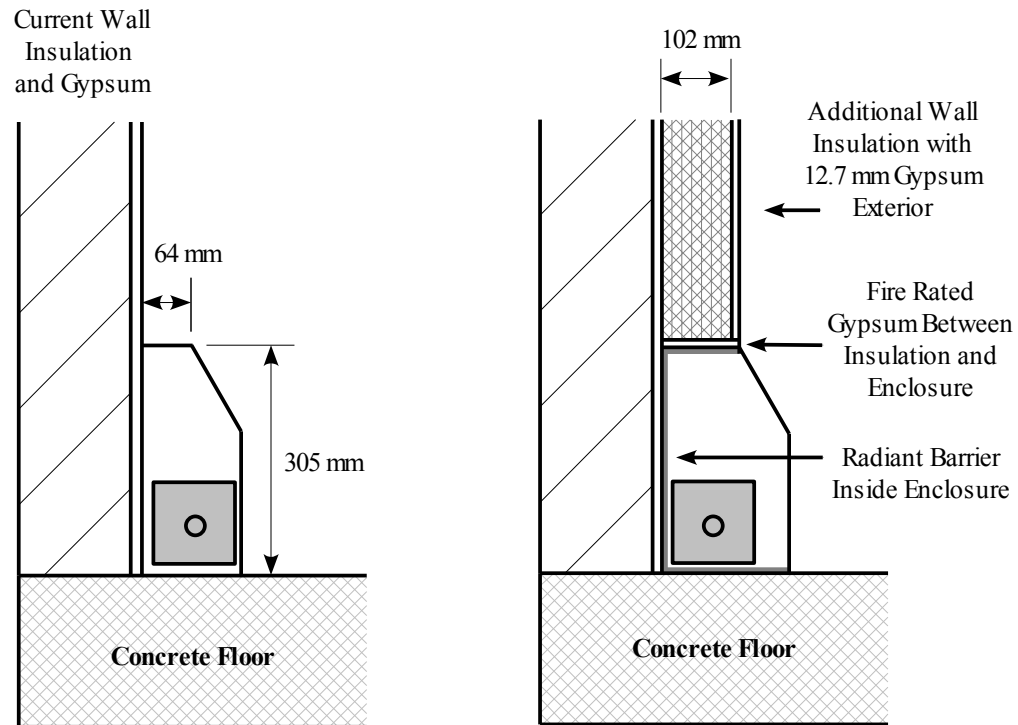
Typical wall heater (left) and proposed interior wall retrofit (right)
